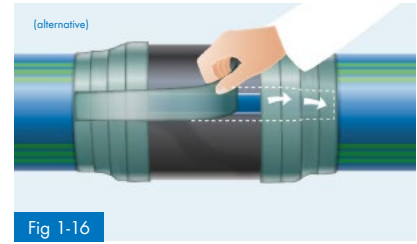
Step 1: Waterproof insulation of the electrical joint (dimensions from OD 110 mm)
